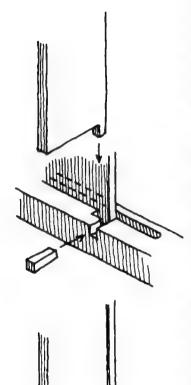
A sketch by L.E. showing how the lower 'hinge' of a door is inserted into the threshold.
